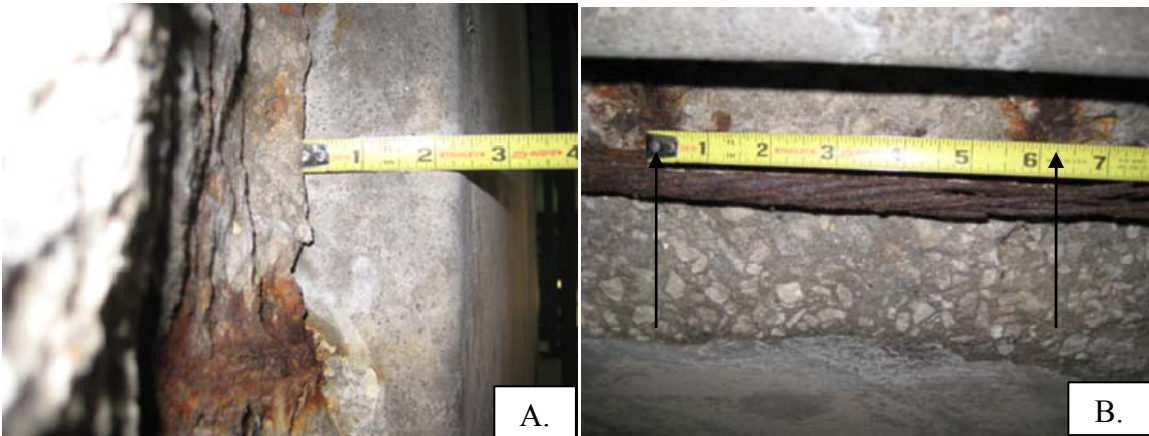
Spalled Sections of PPC Panels (A. Depth of a spalled section, B. Exposed mild reinforcement in a spalled section) (Bridge A4067)
